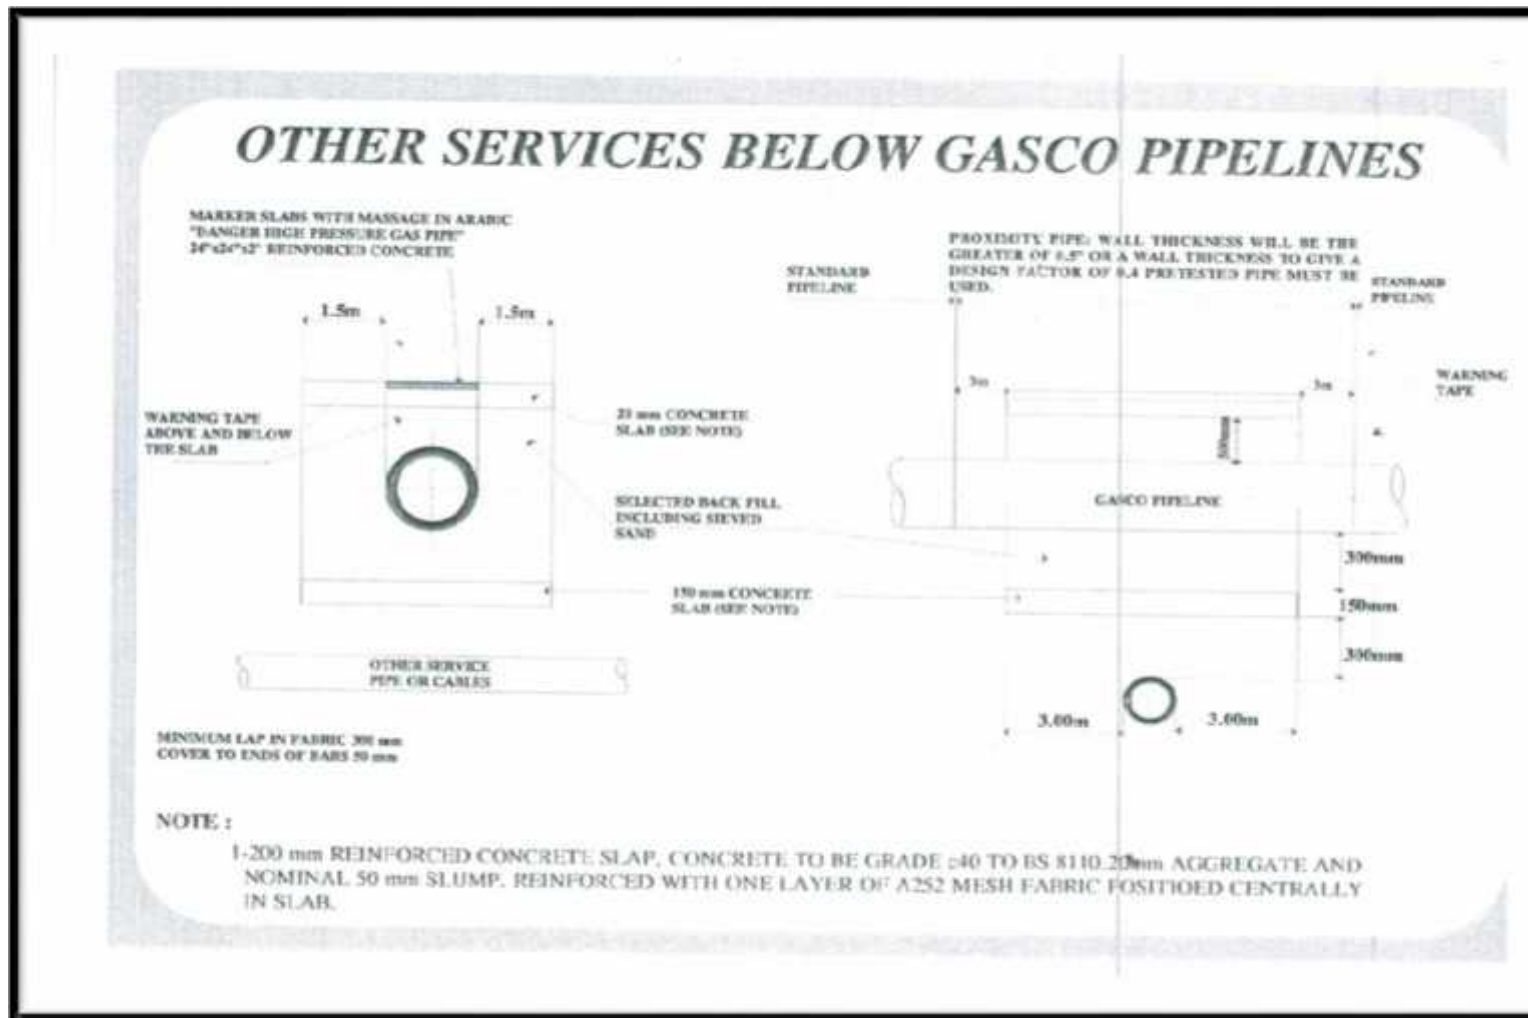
Excavation required in case of having other infrastructure line/cable below the proposed NG pipeline
